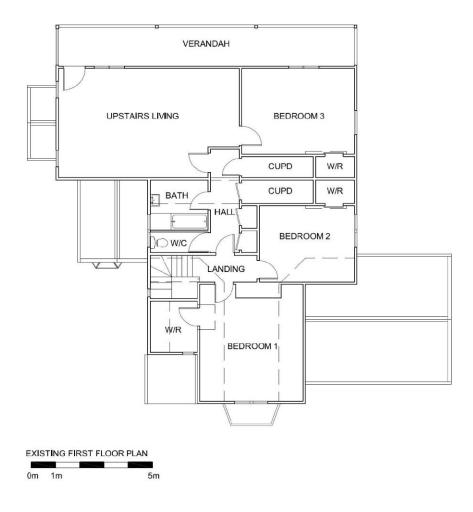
First floor plan at time of building removal (image courtesy Chessa Stevens)
